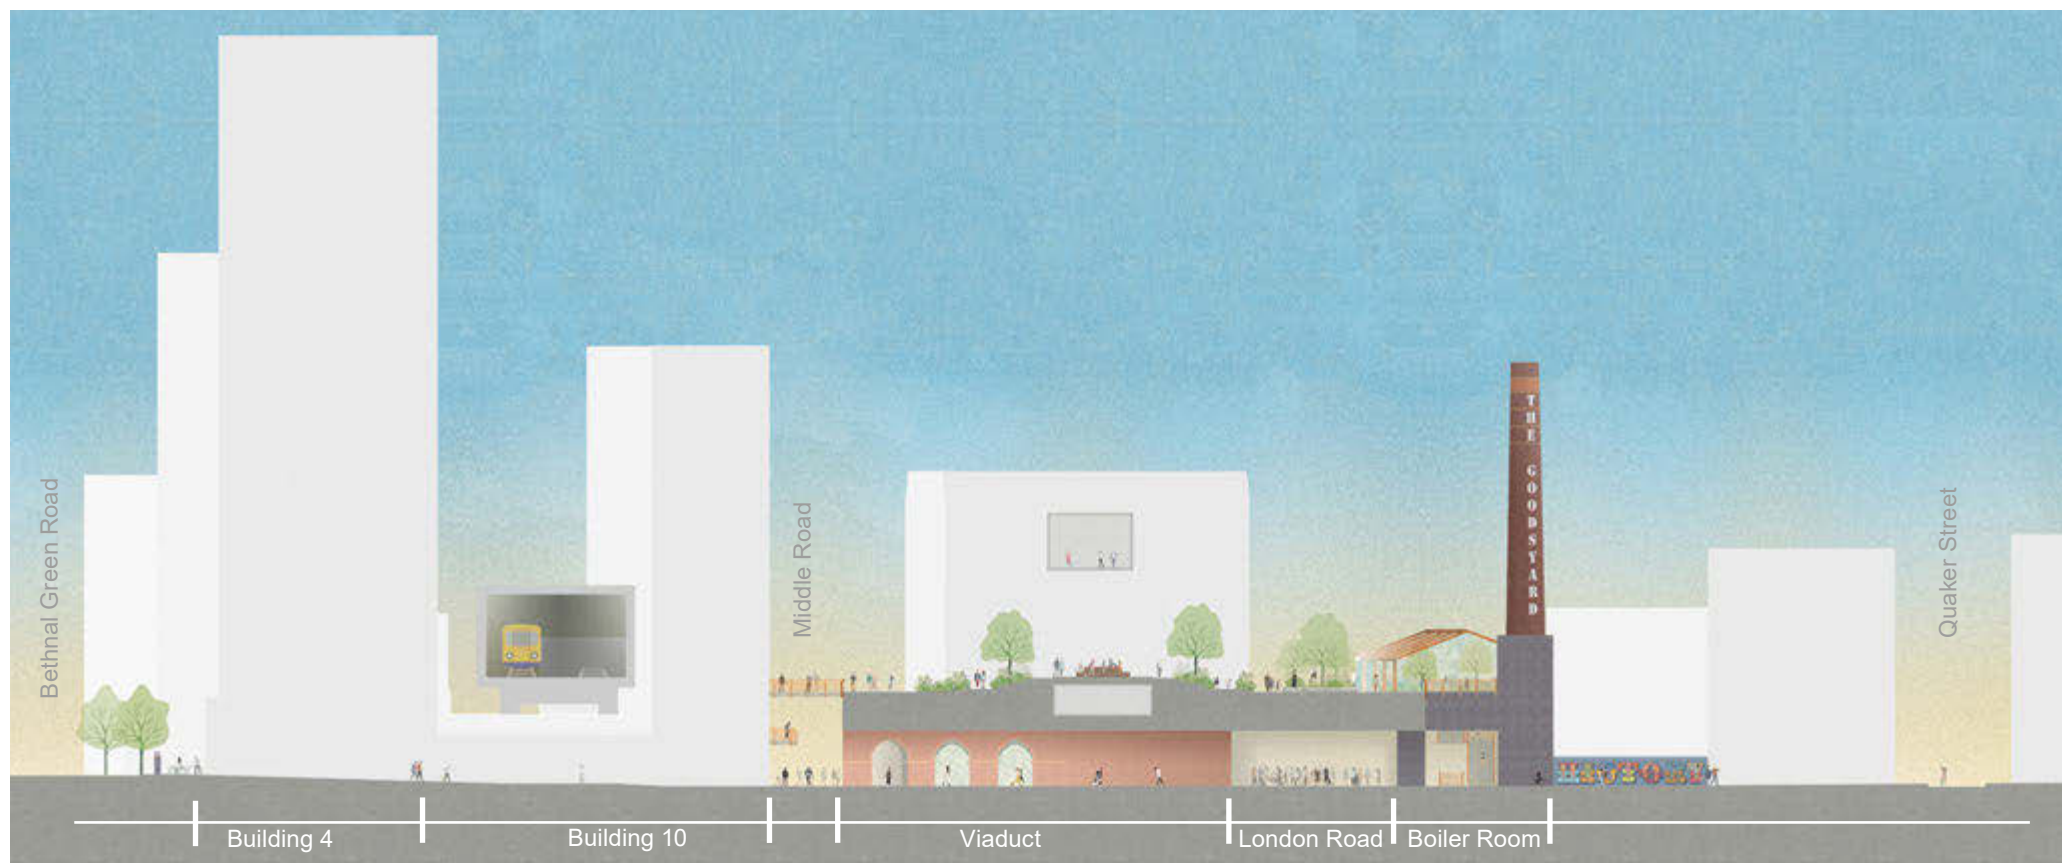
Sectional elevation: Braithwaite Street looking east
